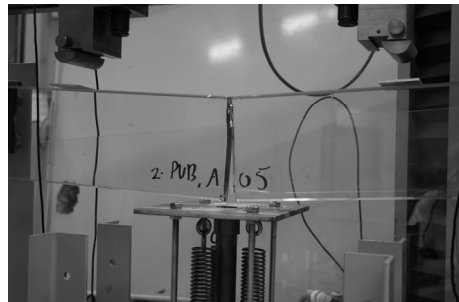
Typical final failure in 2.PVB.A specimen (after resistance test on specimen with model level II (=III) damage).
